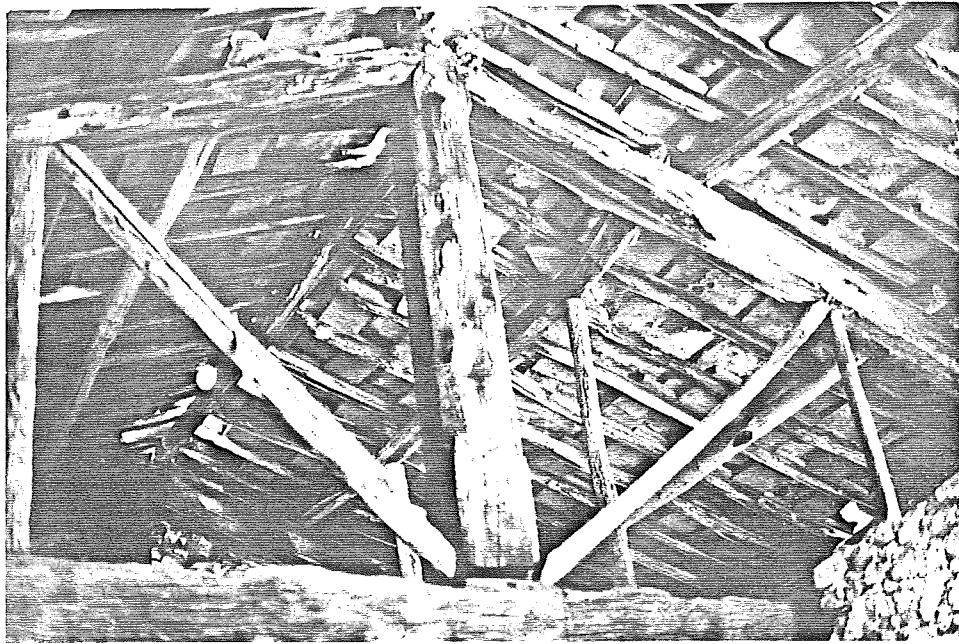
A-frame, mortice and tenon trussed roofing structure of south gable end (Appendix C, BUILDING PLAN, No. 13). View from second floor, southeastern room, showing west side of north-south dividing wall and holes in roof (Appendix C, BUILDING PLAN, No. 19, roof, east side).
